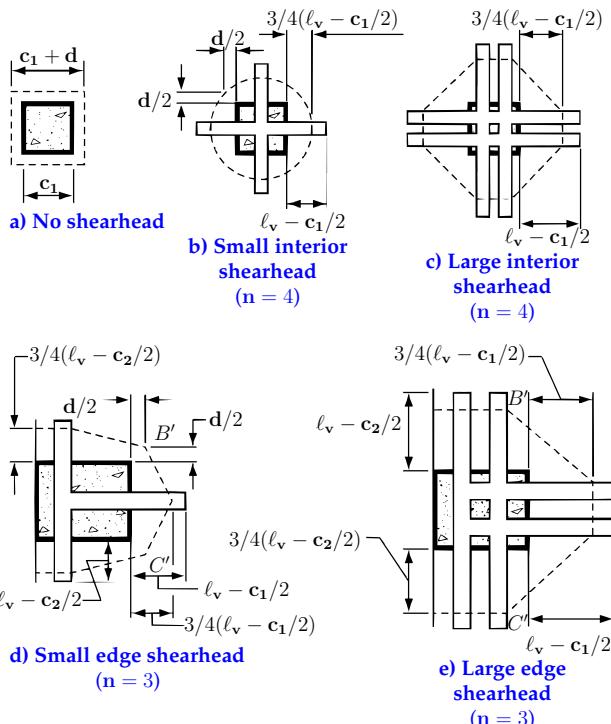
Flat slab shear critical sections with and without shearhead adapted from ACI 318 (2014); a,b,c) Interior columns same as Hawkins (1974); d,e) Edge columns.
